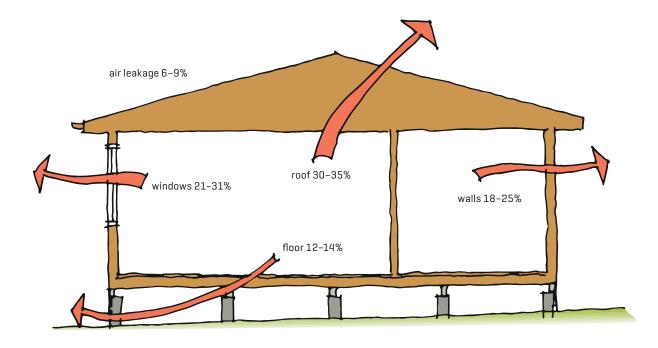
Approximate heat loss through building elements of a typical uninsulated house.
